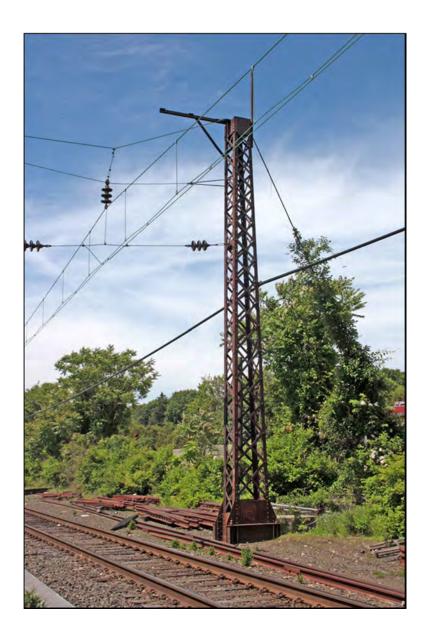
Detail of footing, single lattice pole-bracket type, camera facing southwest.
